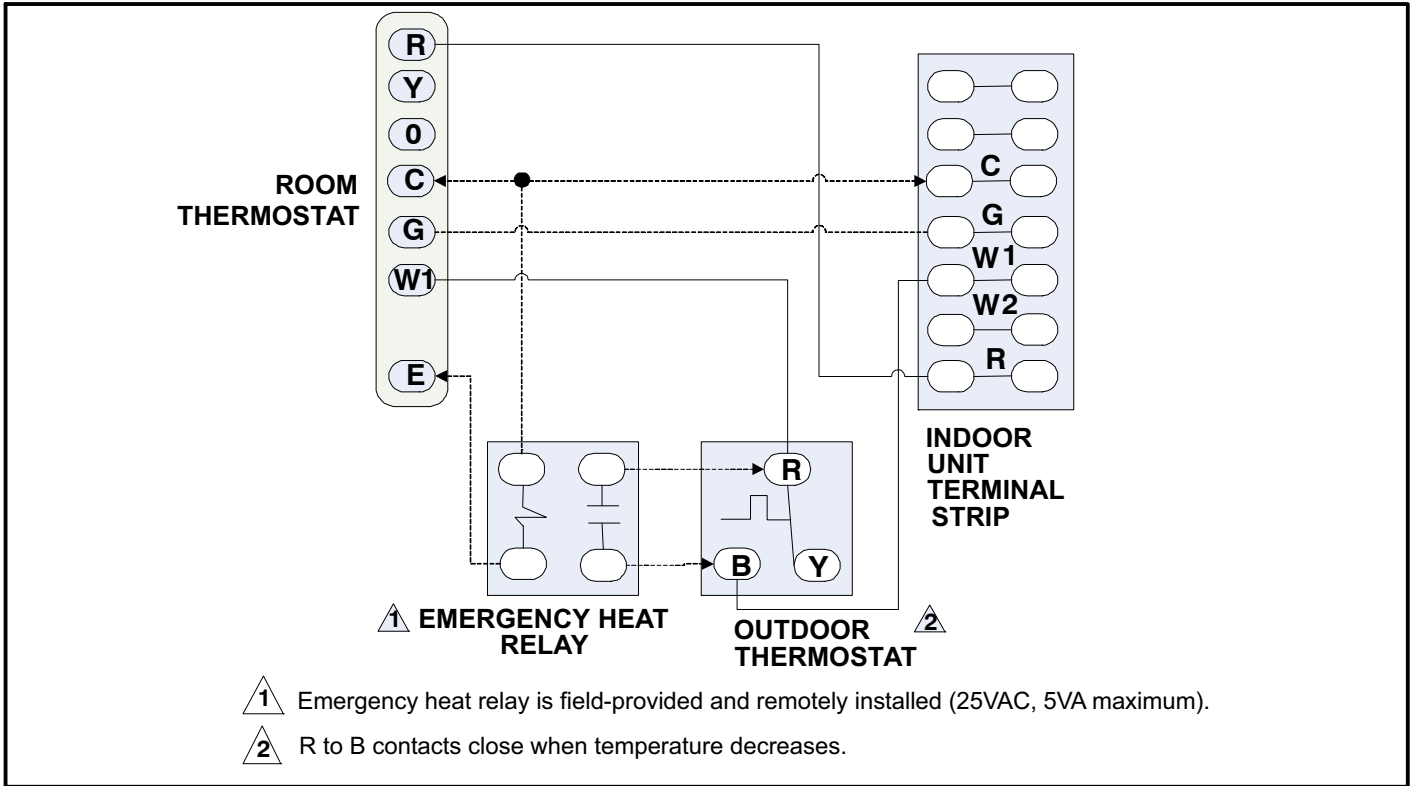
Heat Pump with Typical Single-Stage Electric Heat
